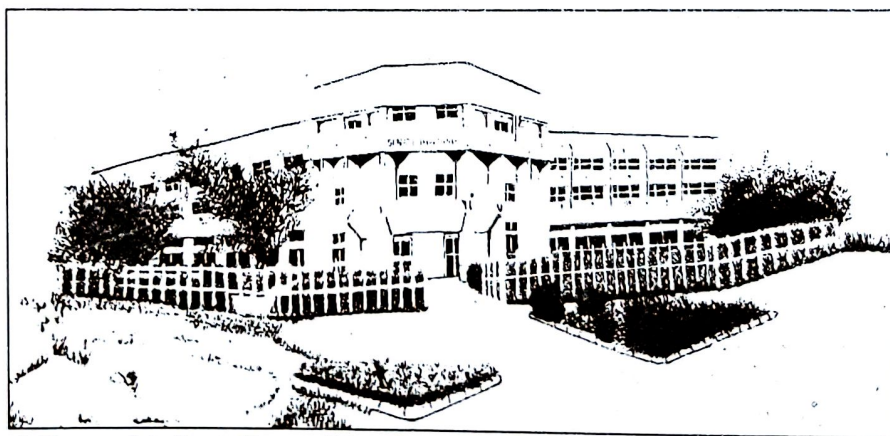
The use of shading to illustrate light and dark spots in a building (source: Author's sketch 2015)
